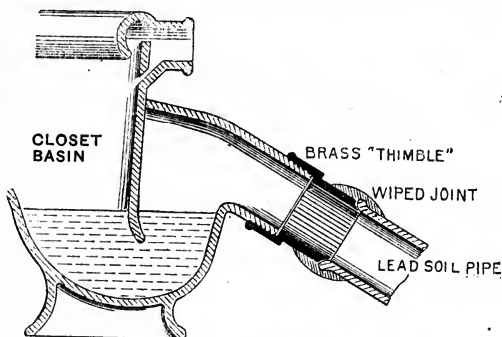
To show connection of lead soil pipe to stoneware trap of W.C.
